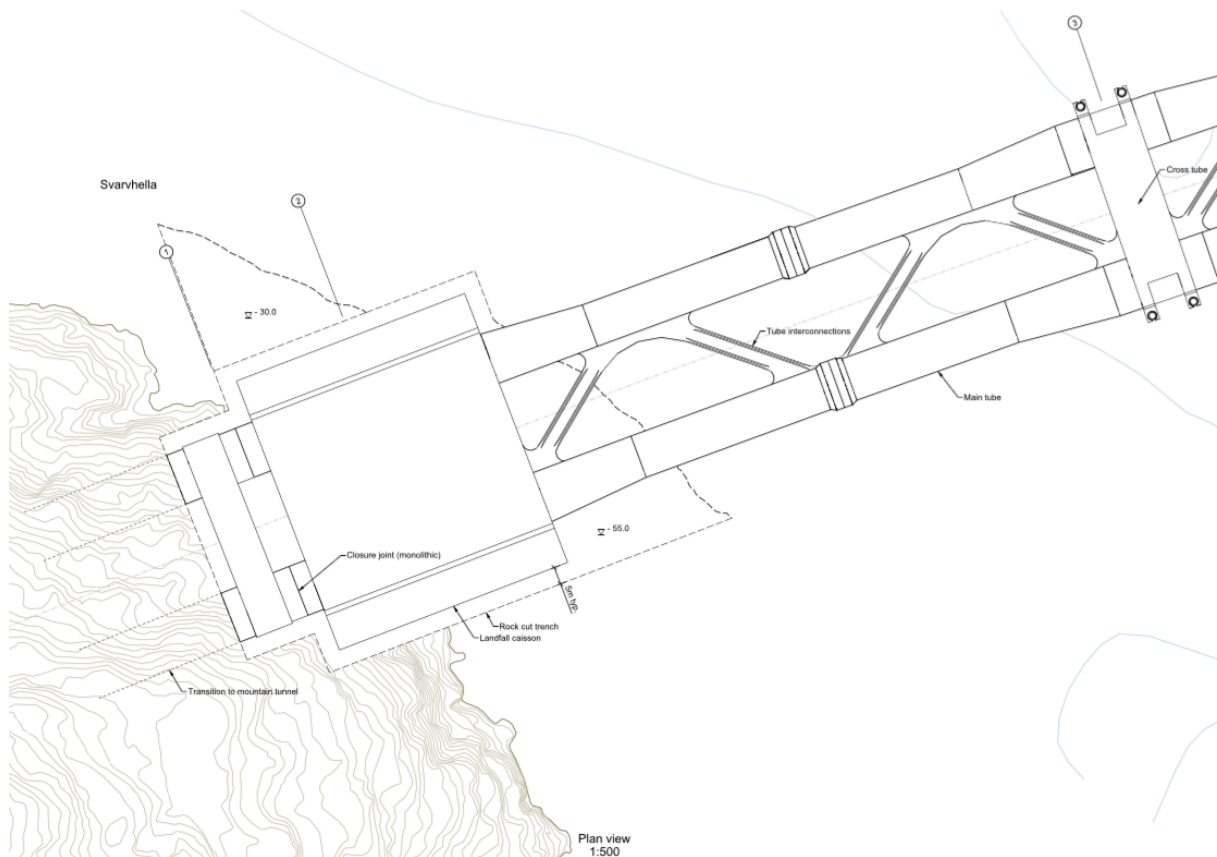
Plan view of the south end section including landfall caisson connecting the SFT to a conventional rock tunnel.
